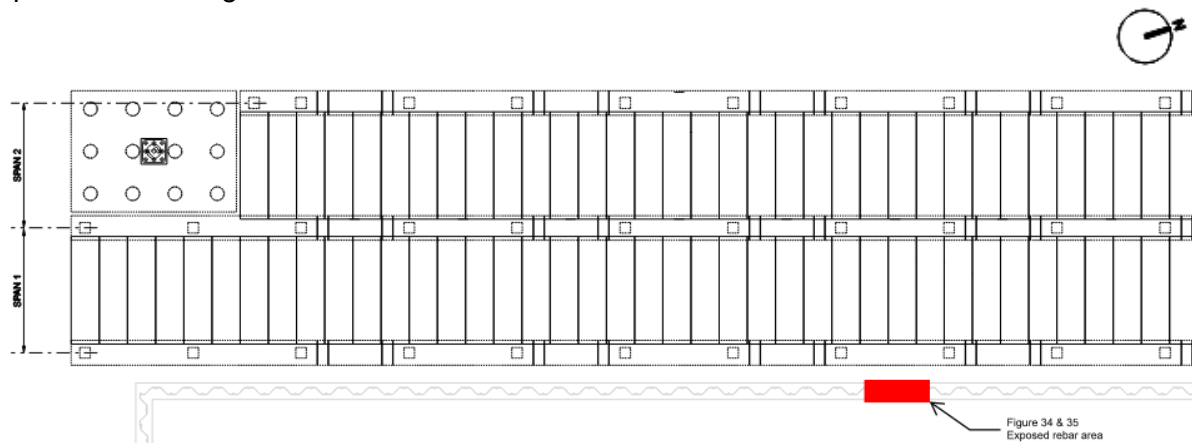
Design Drawings: Exposed reinforcing steel on sheet pile cap
